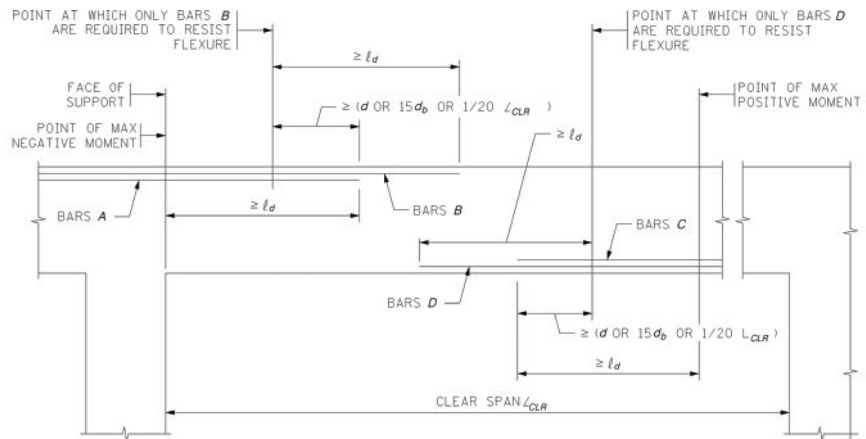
General flexural reinforcement termination requirements. Adapted from Fig. C5.10.8.1.2a-1 of the forthcoming *AASHTO LRFD Bridge Design Specifications*, 10th edition.<sup>2</sup>
